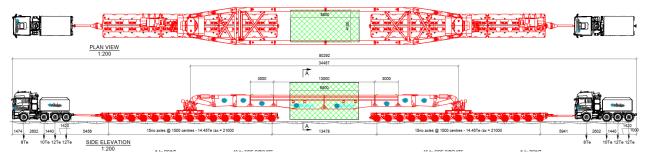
Proposed abnormal indivisible load arrangement (Image courtesy of Allelys Transport)
